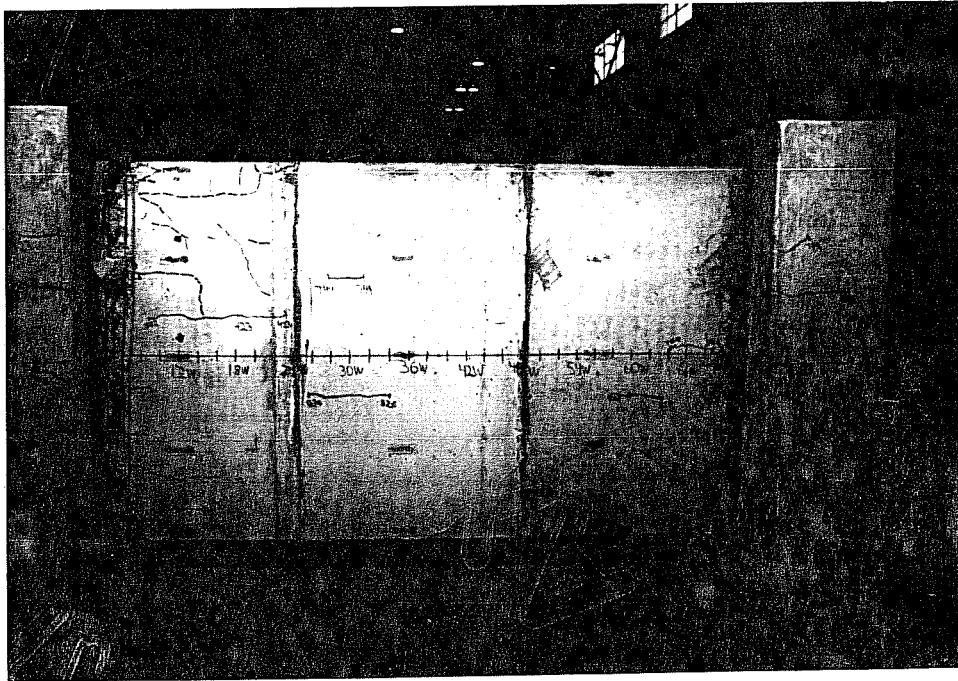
Specimen 3S Cracks Marked before and after Failure
